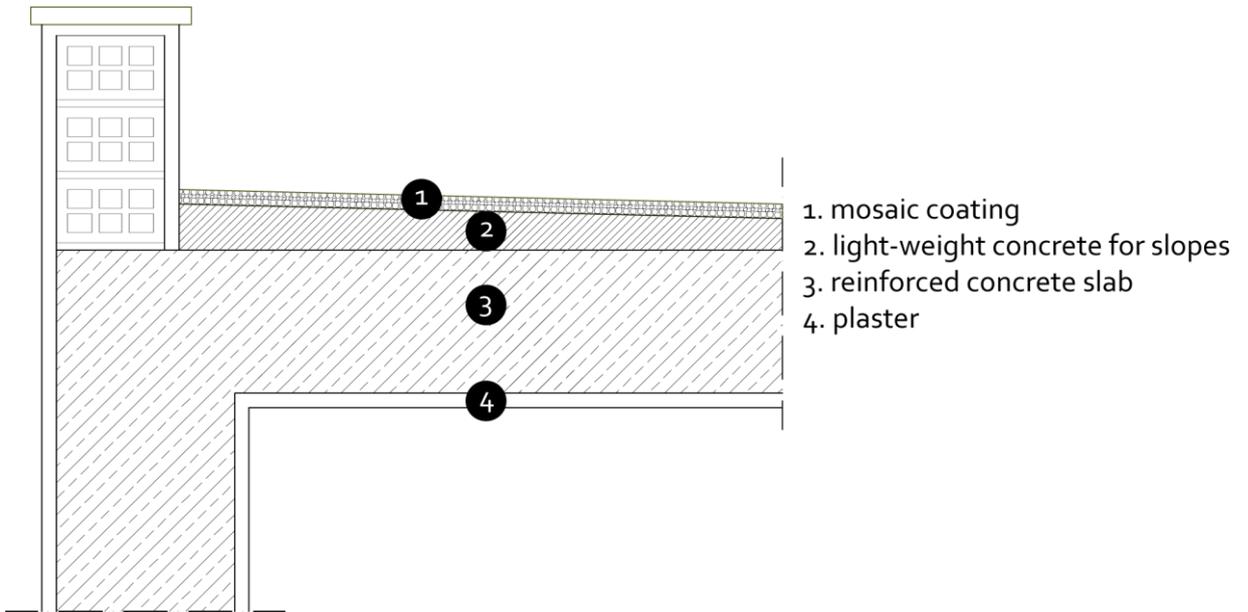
Common practice flat roofs - Buildings like MF1, MF2, MF3 (161)
